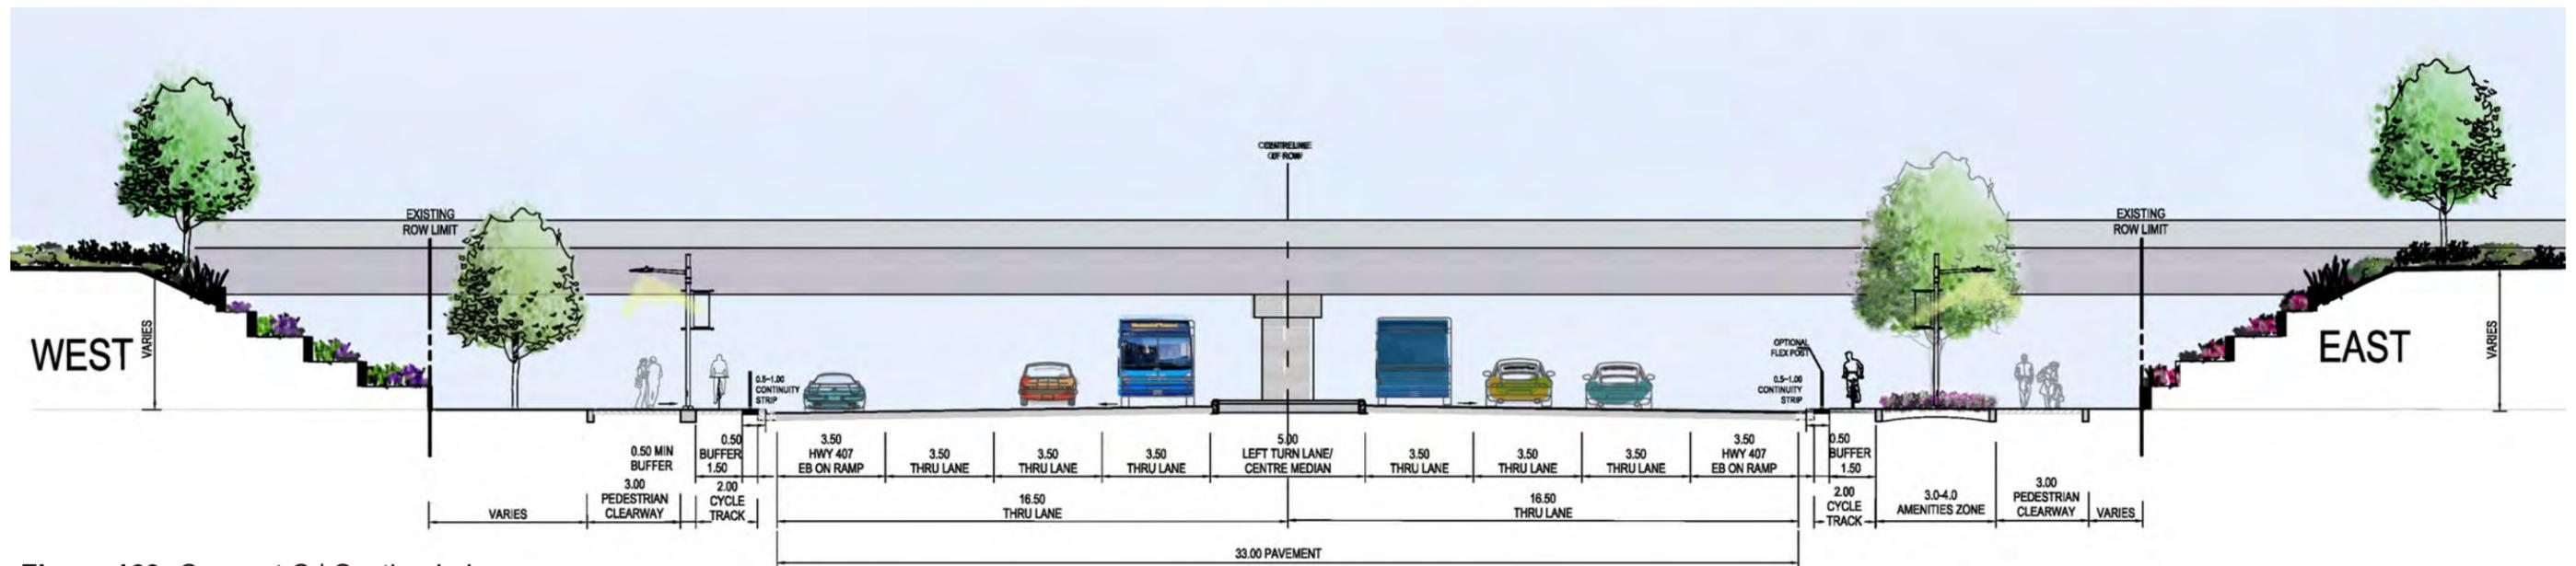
Concept C | Section I2-I2 Approaching 407 @ Langstaff Road East
